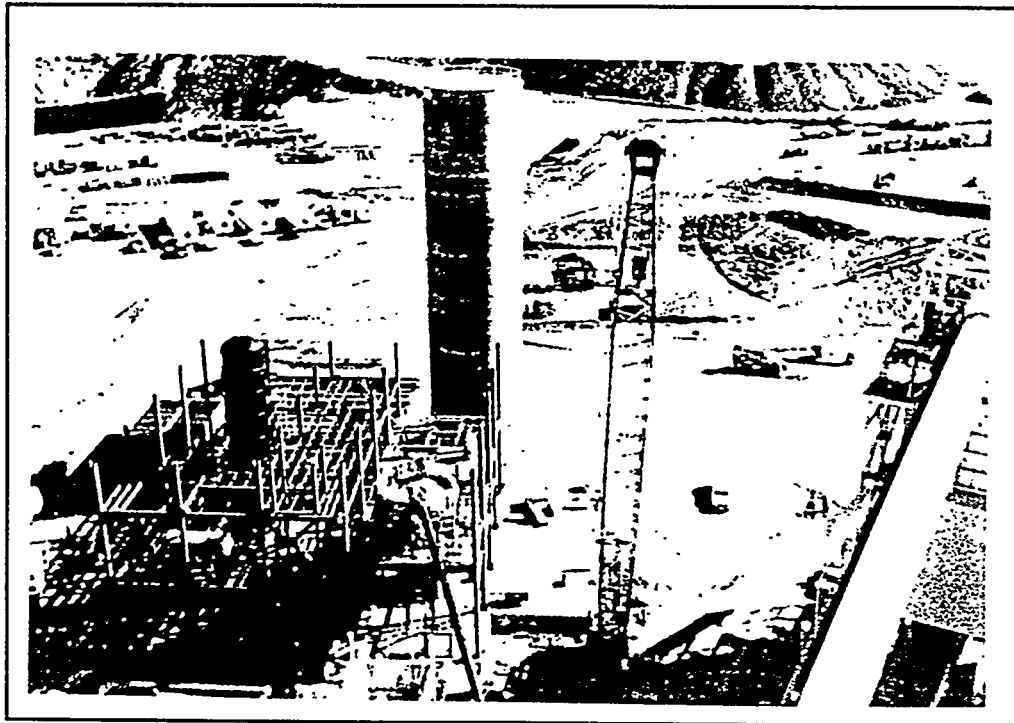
PDF Quench Table and 3rd Floor In Place
